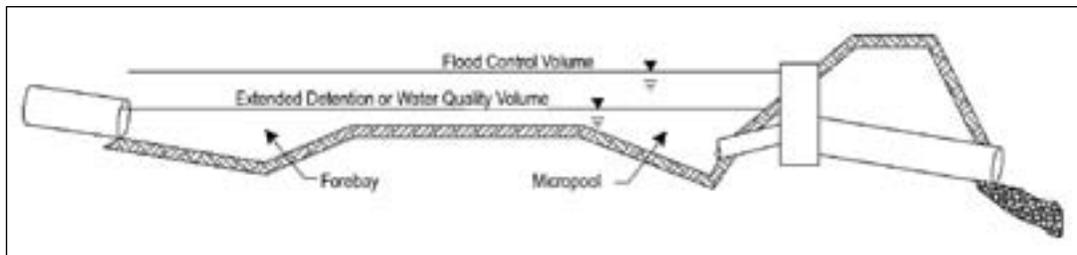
Storm Water Pond with Extended Detention and Flood Control Volumes
